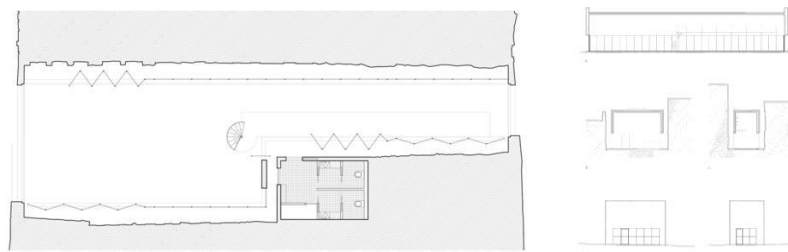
The Exhibition Center's plan shows the passage, while the section elevation shows the glassed facades, visually connecting the outdoor and indoor users
